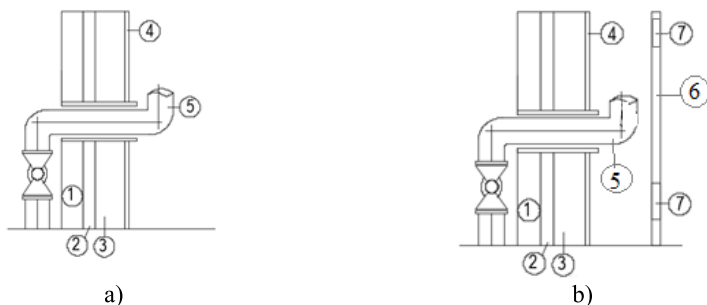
Gas pipeline construction model through the external wall of the building masonry (brick, aerated concrete): 1 – Facade finishing (plaster); 2 – Insulation material; 3 – Masonry wall (brick, aerated concrete); 4 – Interior finishing material; 5 – Gas pipeline; 6 – Finishing material for interior wall construction (plasterboard); 7 – Ventilation hole (bottom or pipeline height).
